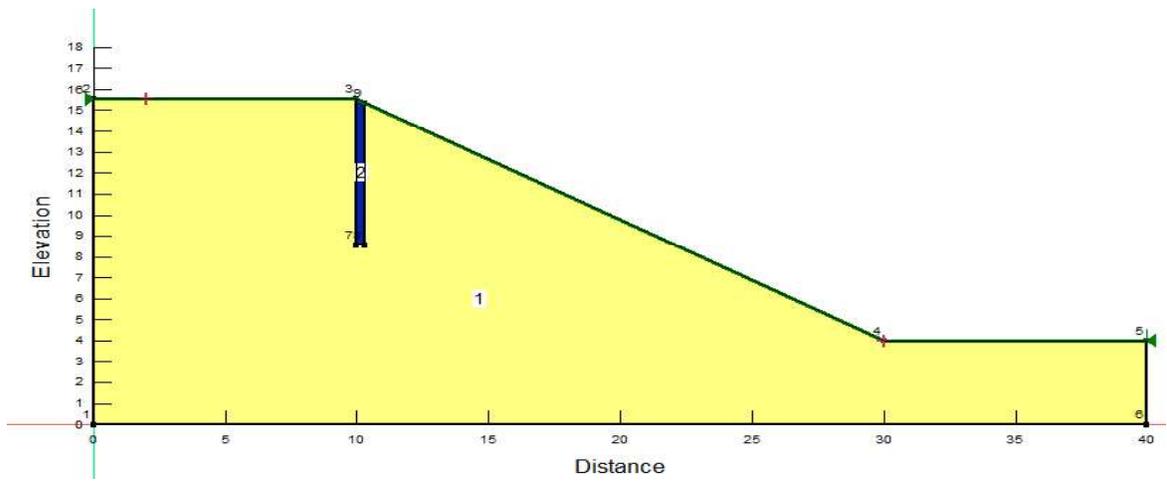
Geometric model of homogeneous earth dam with concrete pile
